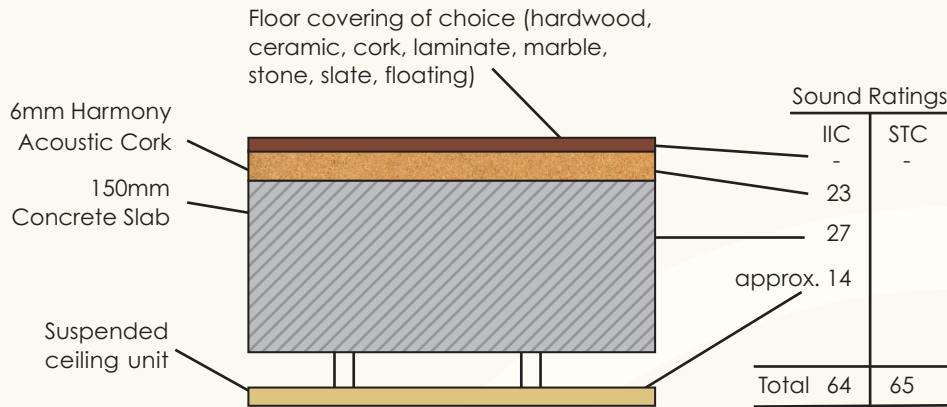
m Harmony Acoustic Cork on 150mm concrete slab
